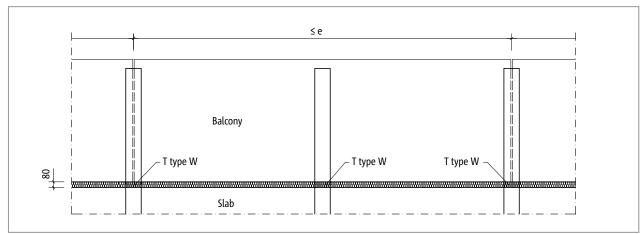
Schöck Isokorb® T type W: Expansion joint layout
